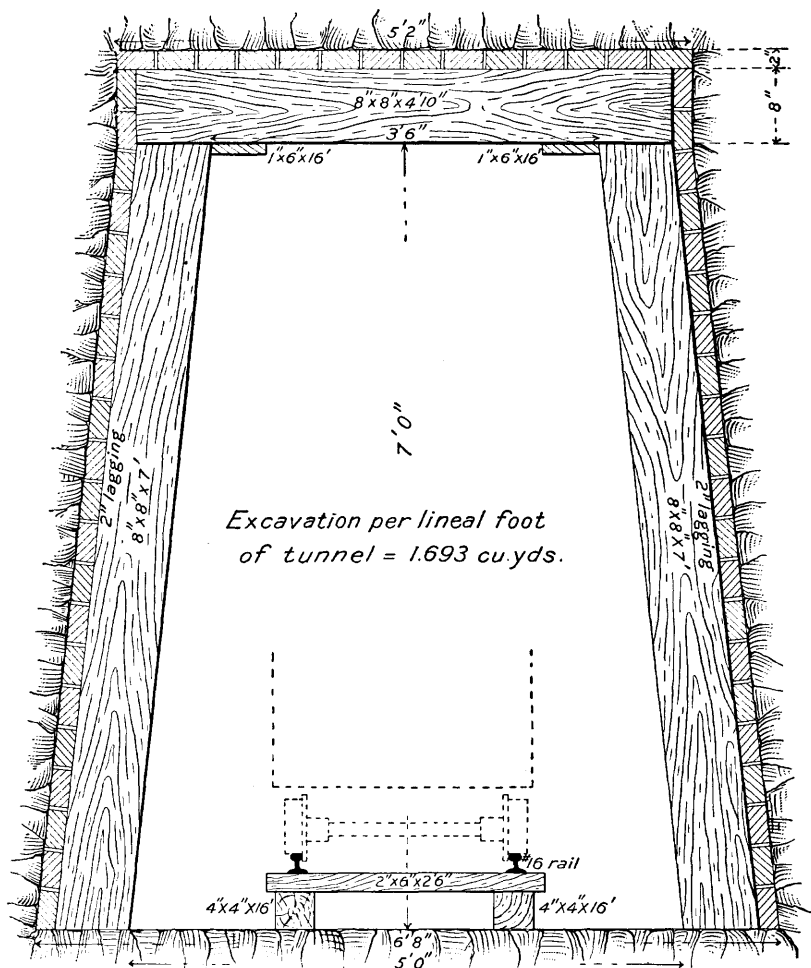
Section of new Santa Barbara tunnel in loose rock.
